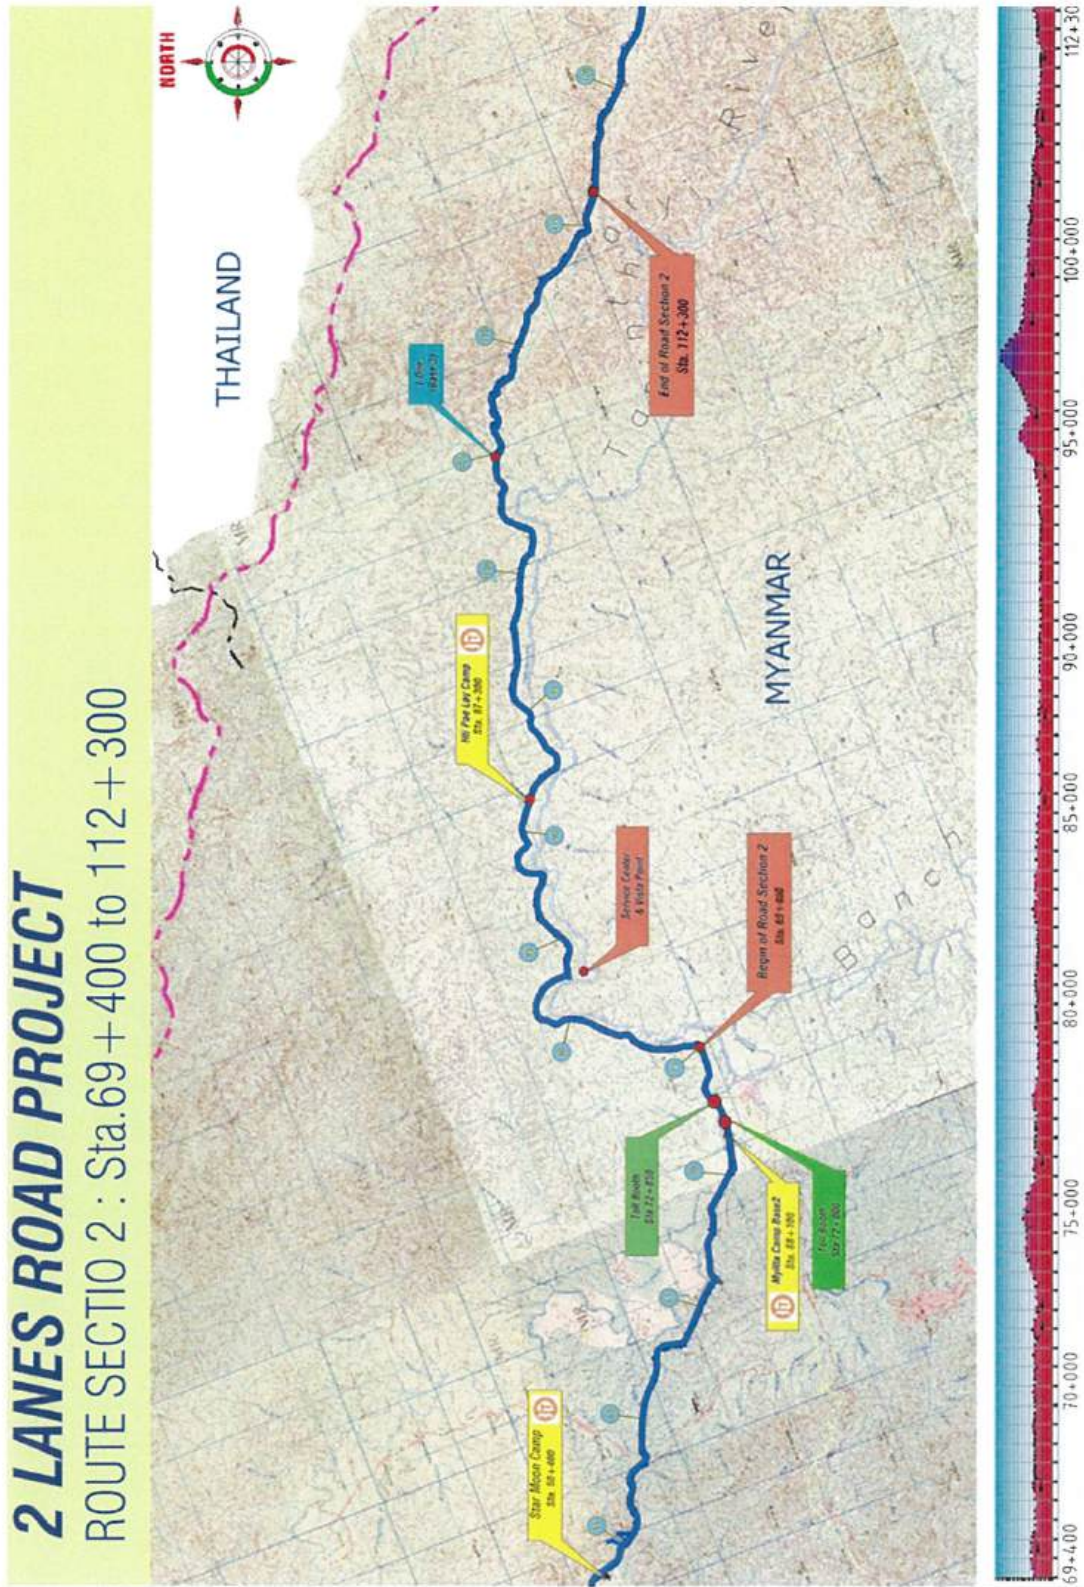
THE TWO-LANE ROAD PROJECT-ROUTE SECTION 2 (KM 69+400-112+300)
